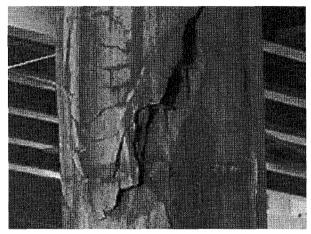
6 foot crack in the pillar of the I-95 Philadelphia Bridge. 13
